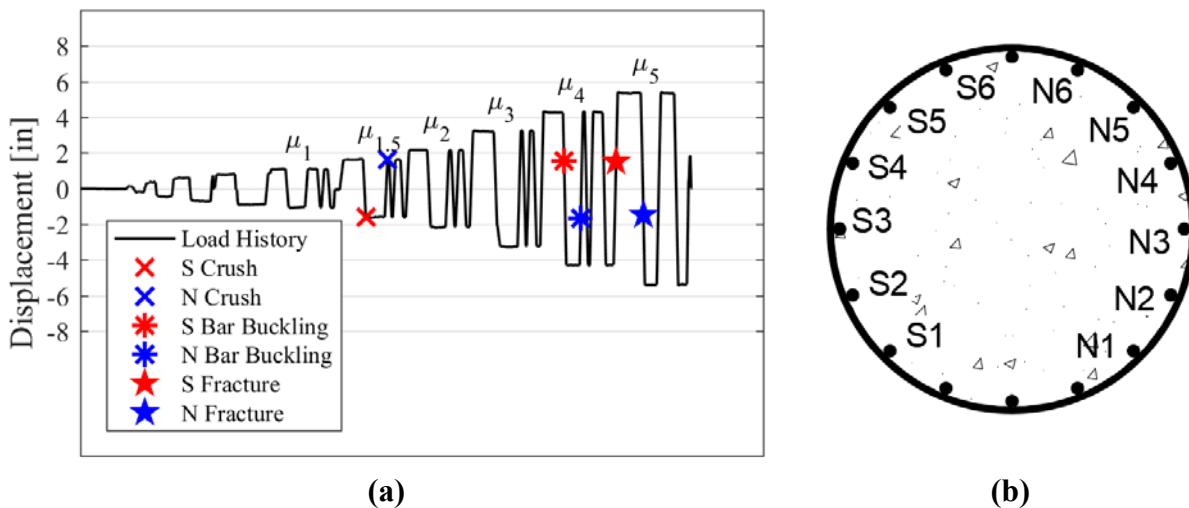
(a) Column test 2 load history. (b) Column test 2 bar labels
